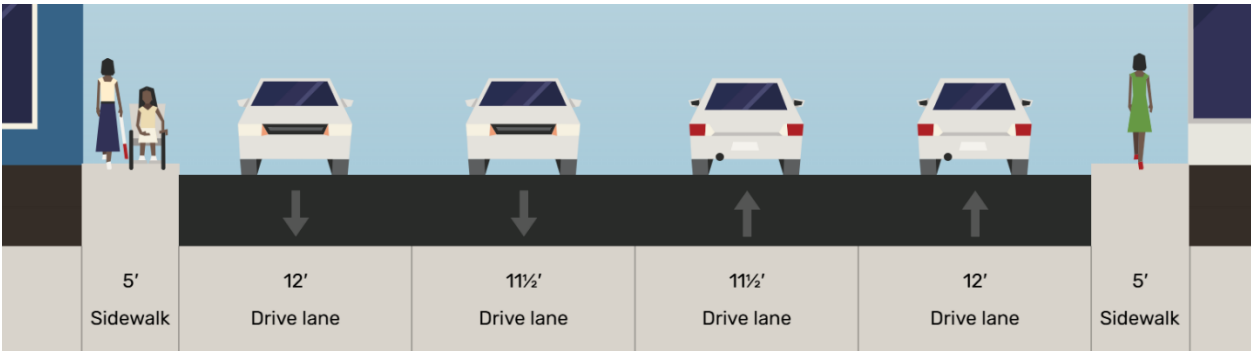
EXISTING TYPICAL SECTION (28TH ST TO 22ND ST)
